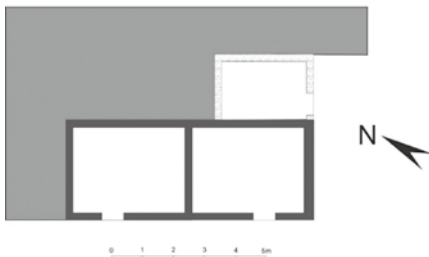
Floor Plan of the Ma Fui Bn HQ (drawn by the author)
